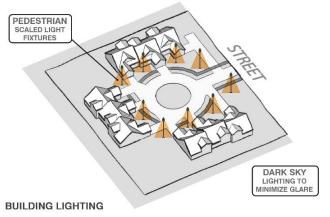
Lighting should be integrated with the site design and reinforce pedestrian safety features, key architectural elements, accents or signage should be a secondary focus of building lighting.
